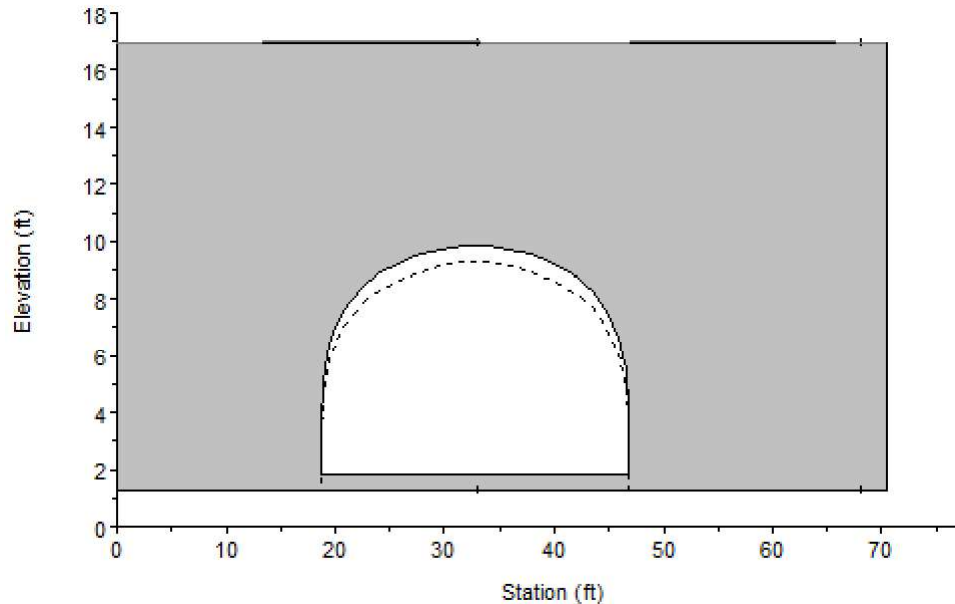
Proposed CON/SPAN Culvert Cross-Section on Kaihalulu East Roadway
